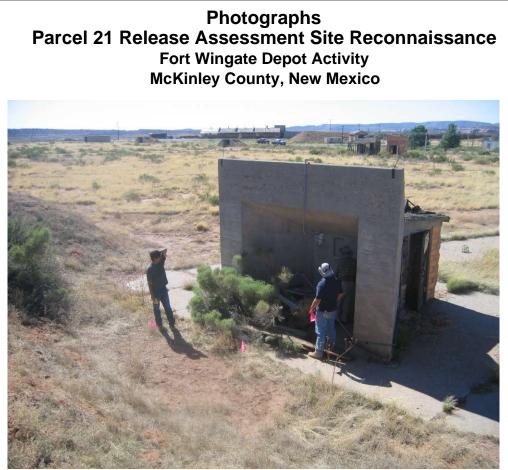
AOC 68, Building 514, looking northwest at exterior condition of building.
